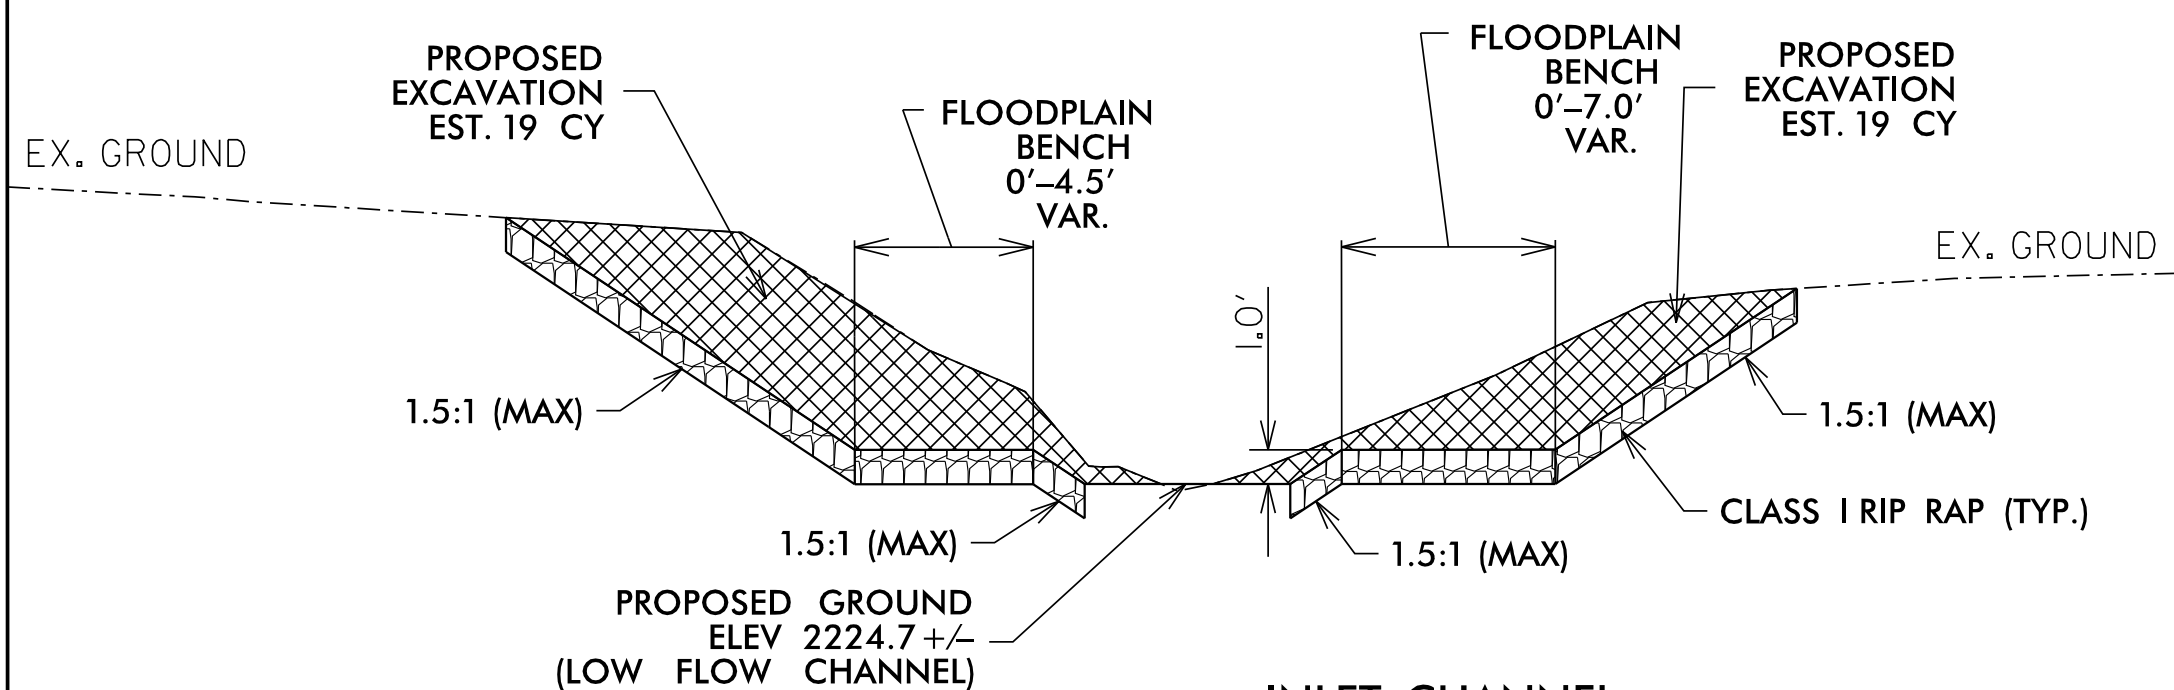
DETAIL A: U/S & D/S FLOODPLAIN BENCH PROFILE
